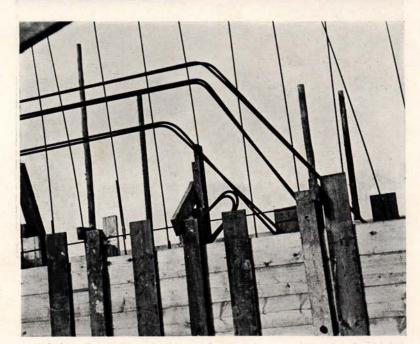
FIGURE I - FORMWORK FOR CONCRETE WALLS.
